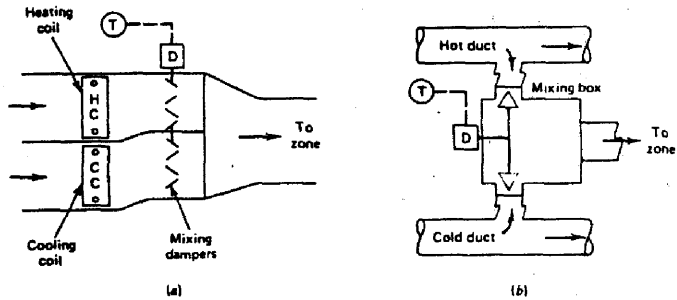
Space control of mixing damper for (a): multizone (b) dual duct and mixing box.
